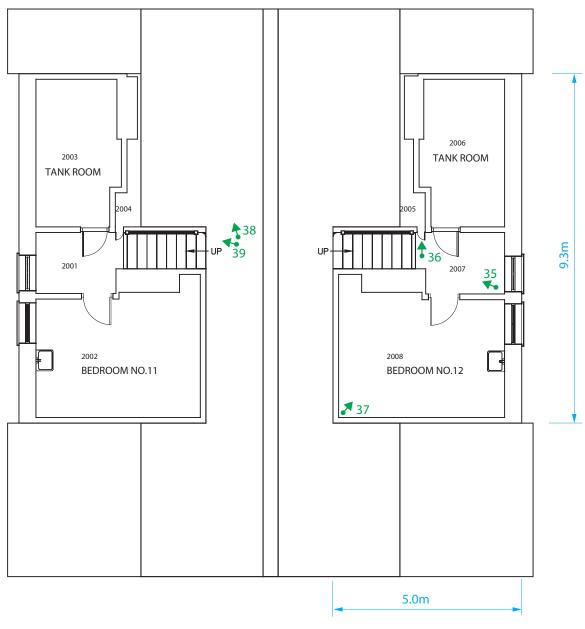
First floor plan of Residence 14 showing plate location (green arrows)
